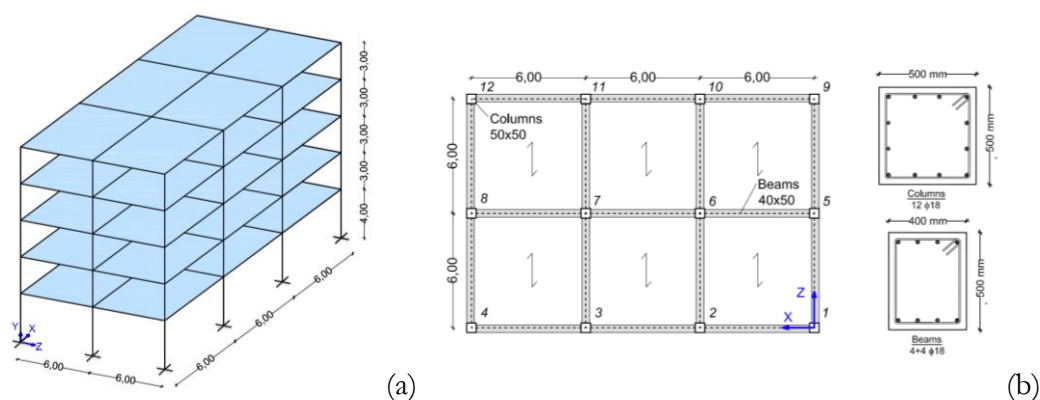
Geometrical dimensions of the case study structure: (a) 3D frame view; (b) dimensions in plan.
